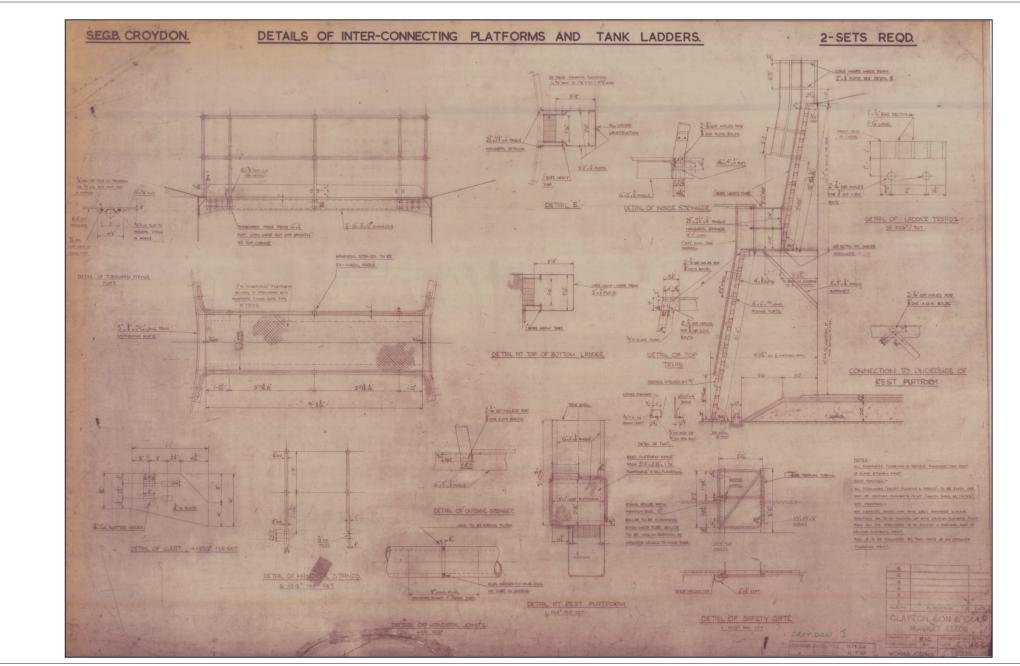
Archive Plan of Connecting Platforms and Tank Ladders for Gasholder No 4, 1964 (NGA Ref: SE\_CRD\_E\_T\_11)
